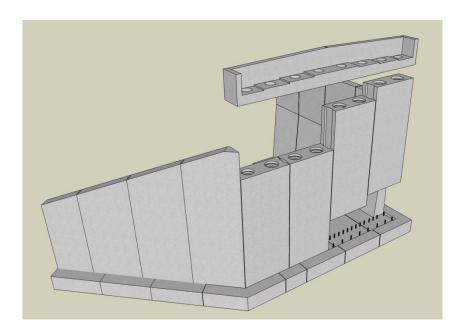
Prefabricated Cantilever Abutment
